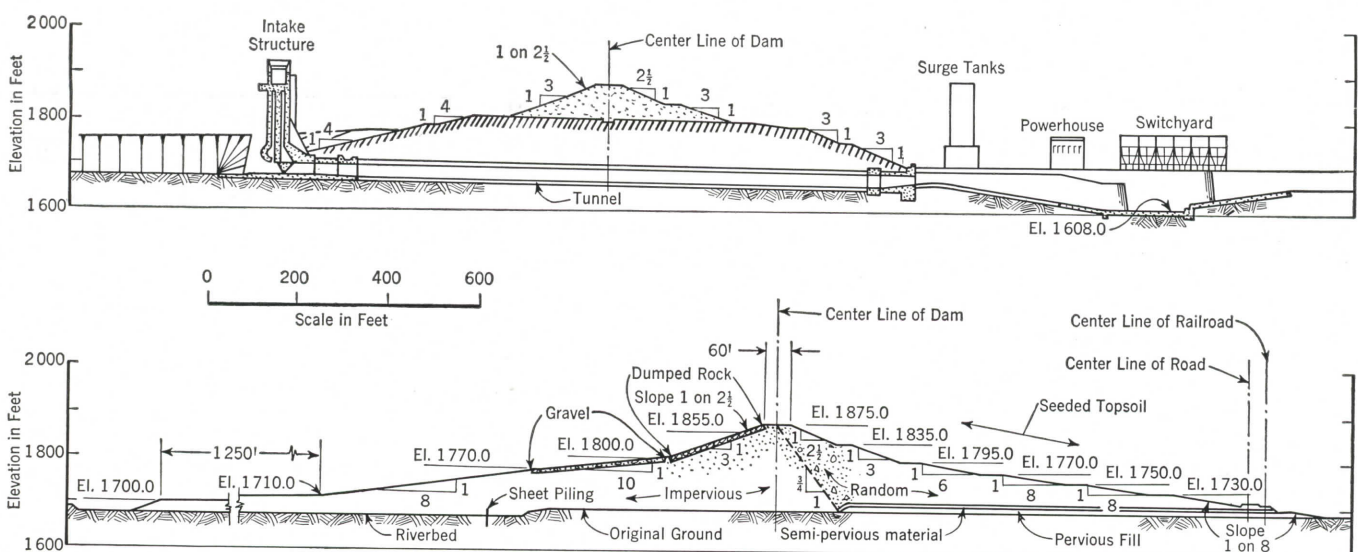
PROFILE OF OUTLET WORKS (at top) indicates relative locations of intake structure, tunnels, surge tanks, powerhouse and switchyard. Maximum embankment section (below) has slopes varying from 1 on 2½ at top to 1 on 8 at bottom. Protection on upstream slope consists of 3 ft of rock over 1 ft of spalls over 1 ft of bank-run gravel from top to El. 1,800, and below, bank-run gravel to El. 1,770. Exposed downstream slopes between berms will be protected with vegetative cover.
